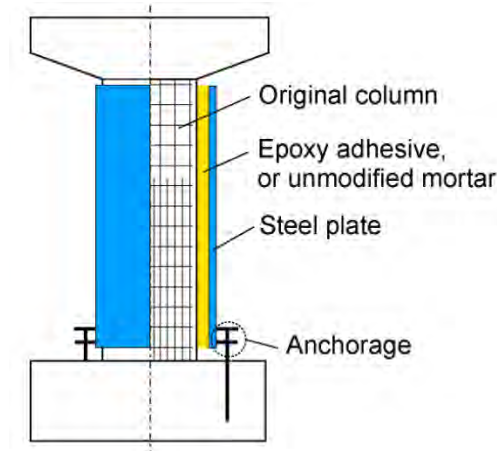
Steel jacketing of a RC column (Zhang et al., 2009)
